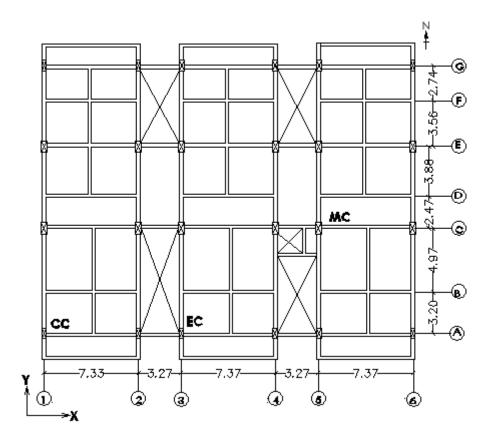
Typical Beam layout of Building (All Dimensions are in Meter)
